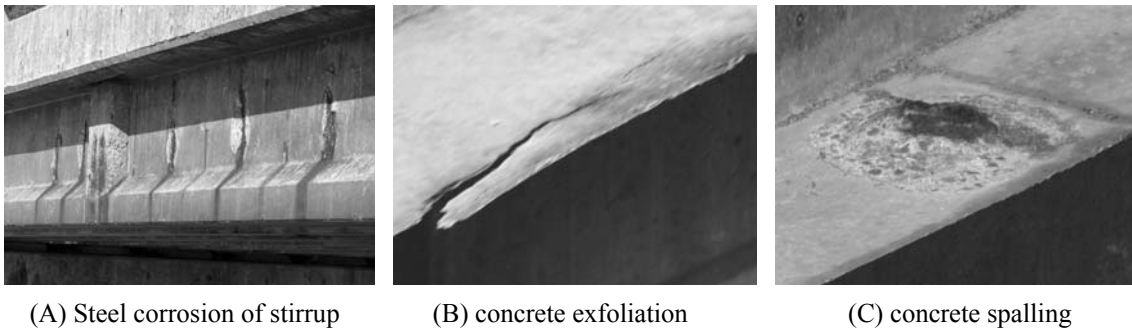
The PC T-girder bridge constructed in 1978 with the damage that is midway between the “acceleration stage” and “deterioration stage”.
